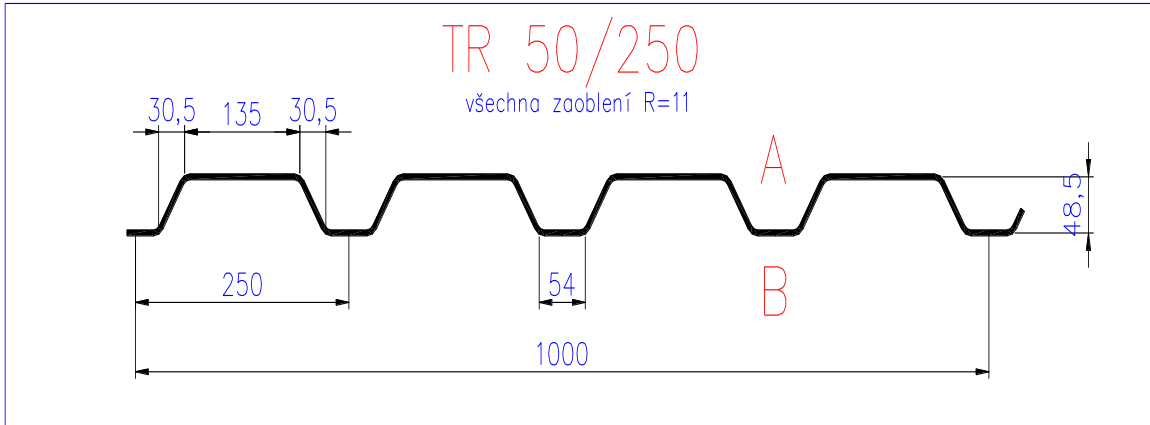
Geometry of the chosen trapezoidal sheet.
